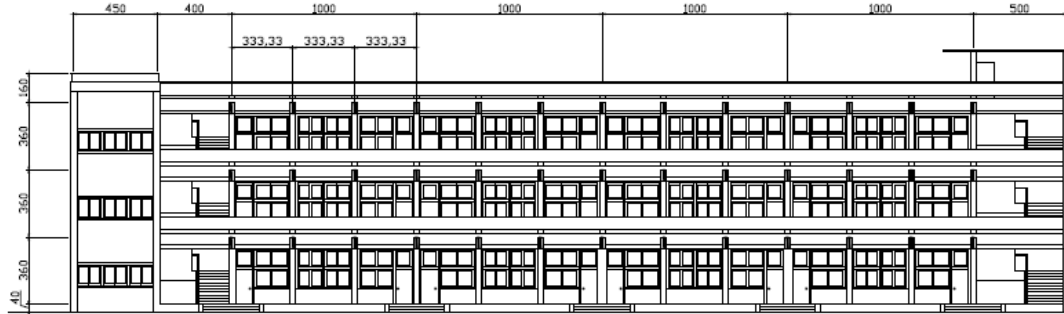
Three-story conventional school building elevation layout (Yeh and Chou 2017)
